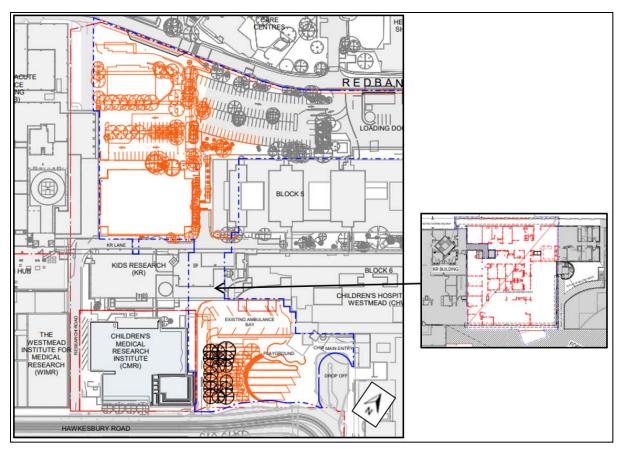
| Demolition Plan, Kids Research internal demolition detailed on the right (Source: Applicant's RtS)
